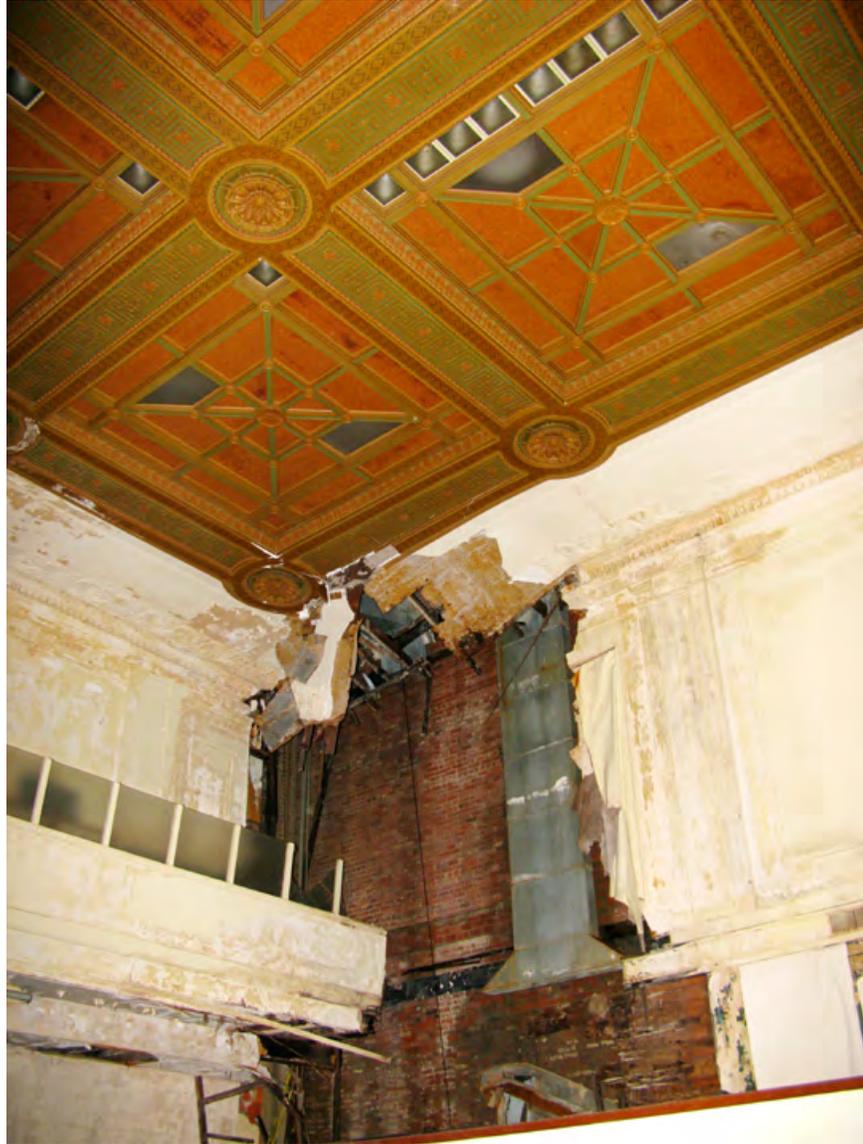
Loss of wall panels and part of the ceiling, southwest corner of Exchange Hall.
